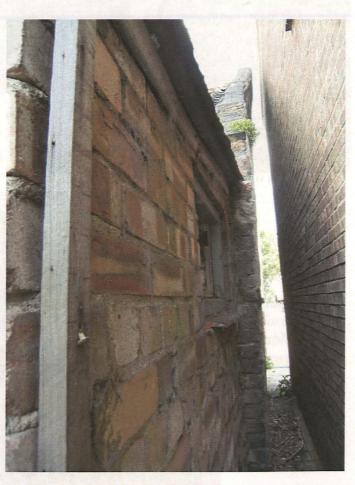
Detail of south gable end, showing exposed brickwork of southern wall and projecting wall at southeast corner of building, looking northeast
